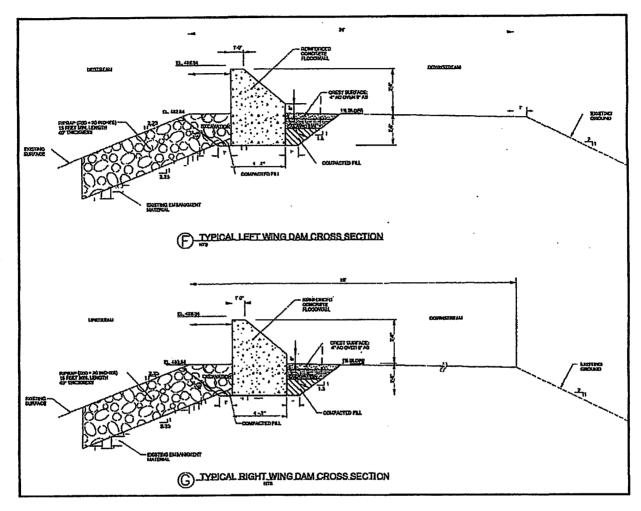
Preliminary typical cross sections for new floodwalls at the Left Wing Dam and the Right Wing Dam.
